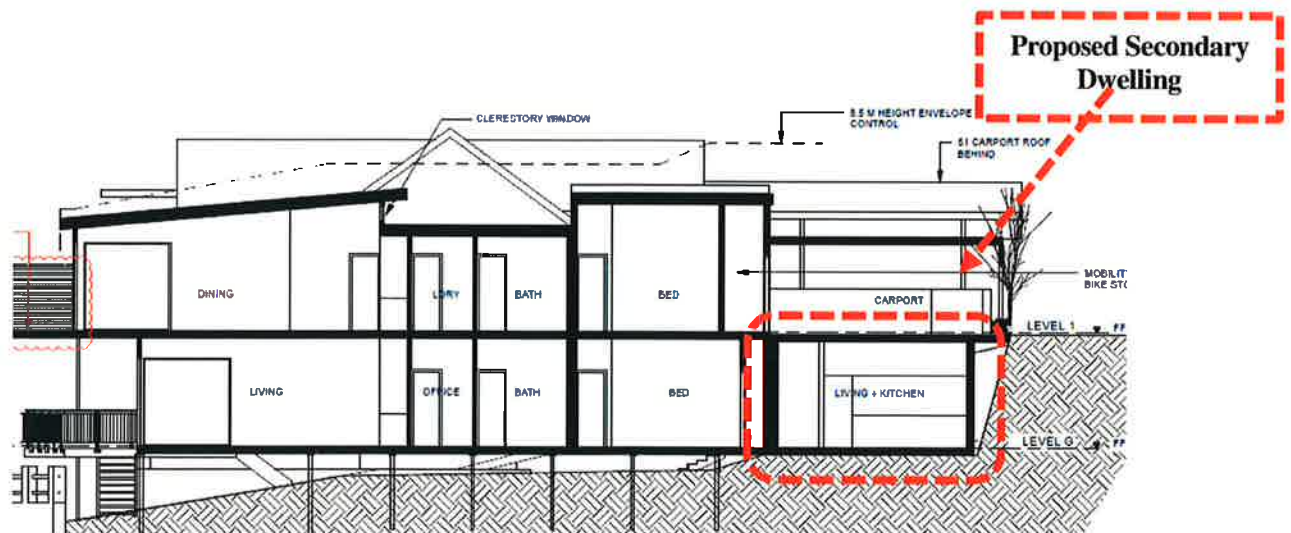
Section showing proposed Secondary Dwelling beneath Carport
